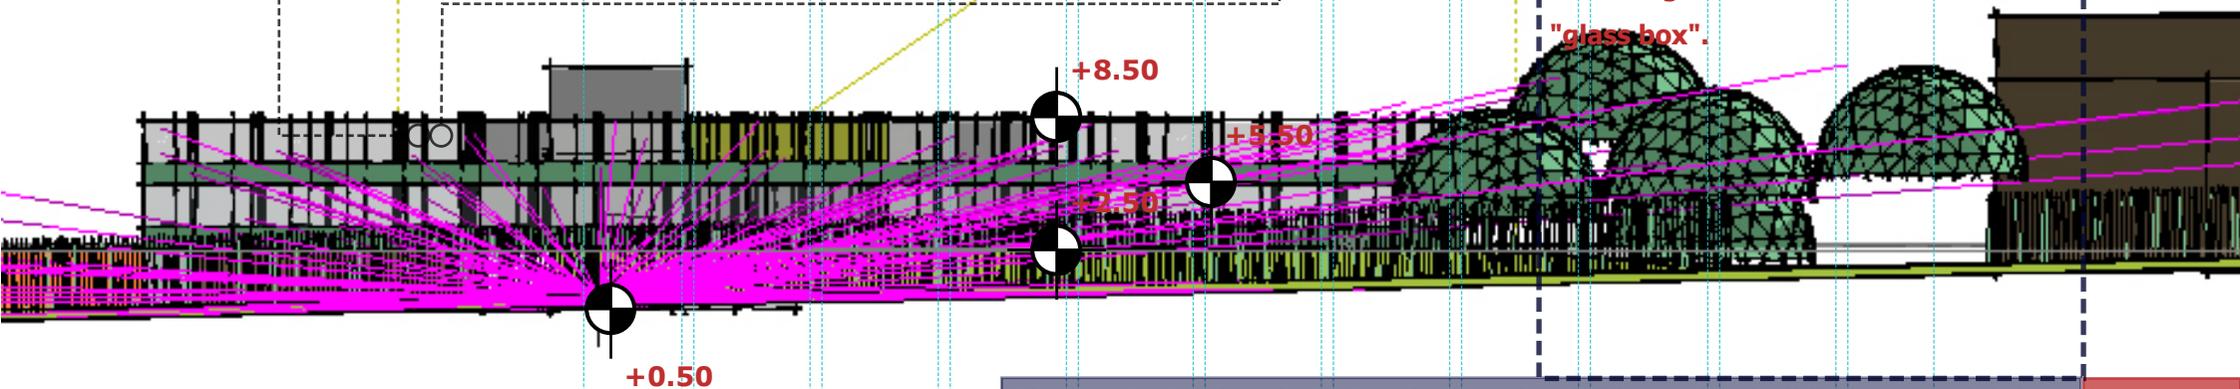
Boukunde I - South Elevation (Old weather building to the right)
